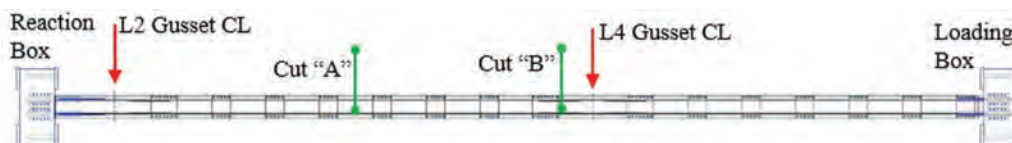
Plan view sketch of specimen showing locations of the torch cuts.
